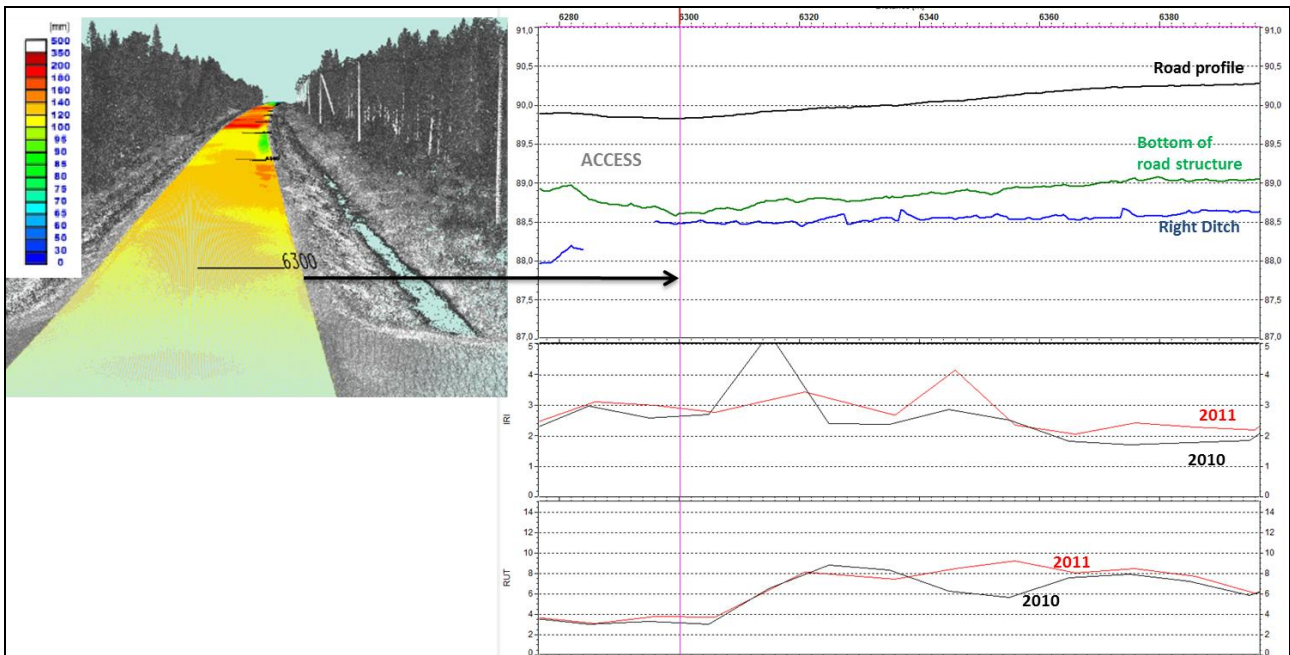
\_3. Example of drainage problems at chainage 6300 m, road 934, section 3. The private road access is preventing the flow of water downhill and has caused material sedimentation above the culvert which can be seen from the horizontal bottom level of the right ditch (the blue line on the top frame). The longitudinal gradient in the 78 m long section before the private road access is only 2.2 mm/m, when minimum specified value is 4 mm/m. The roughness and rutting values (second and the third graphs on the right) have started to grow at this point. The values from 2010 and 2011 are given in both frames. Figure 432\_7 shows still photographs from the same point.
